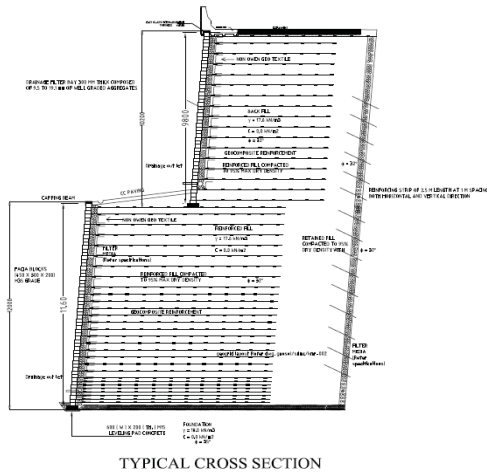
Typical cross section of tired reinforced soil structure provided at location-1
